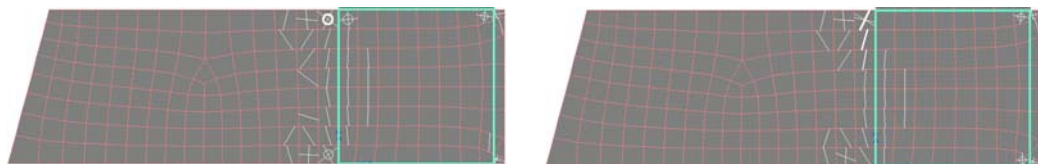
Test concrete beam, 8C-IA – 1050 kN (left: no reinforcement, right: with reinforcement)
